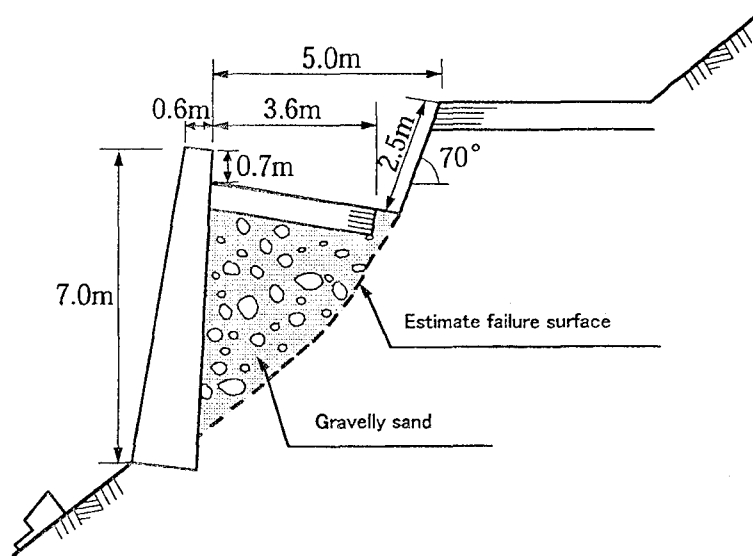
Cross section of collapsed gravity-type concrete retaining wall
